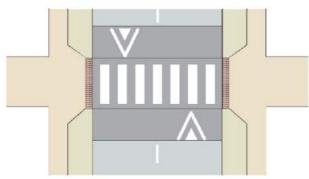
25: Typical raised crossing Source: Abu Dhabi Urban Street Design Manual
